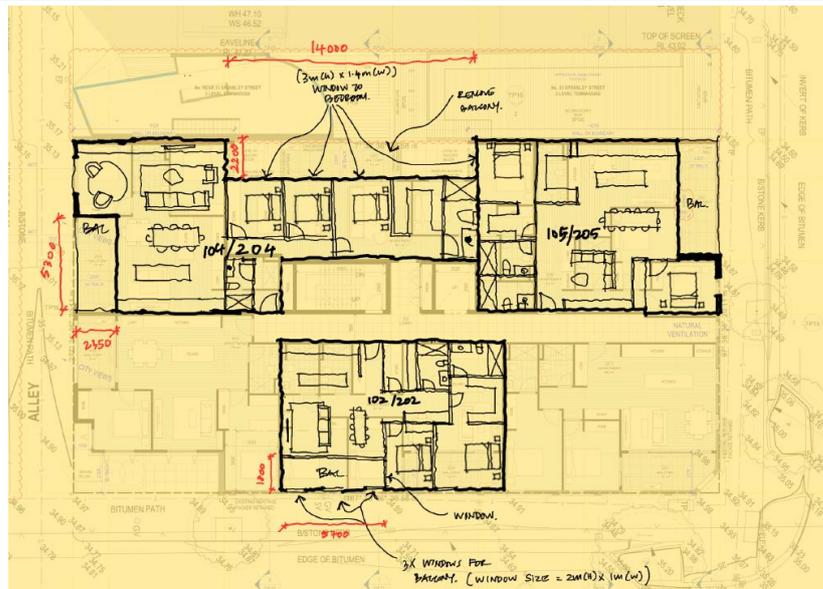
The revised Levels 1 & 2 floor plan within the submitted sketch plans.
